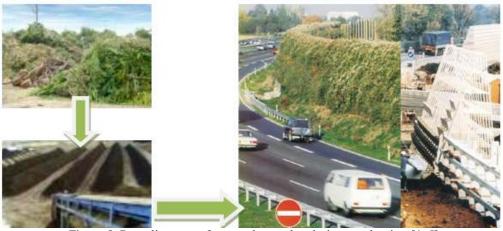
Recycling waste from gardens and parks in street barriers [1, 5]
